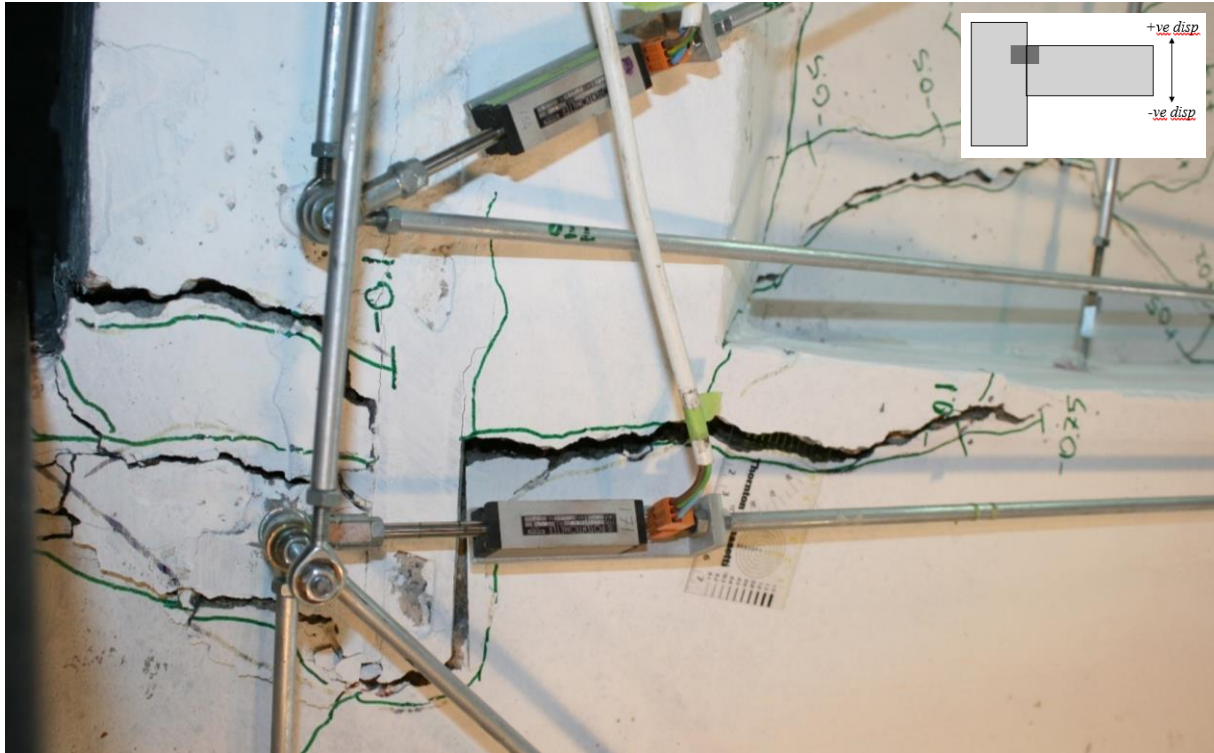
Crack at the socket for non-structural components, at 1.5% beam rotation.
